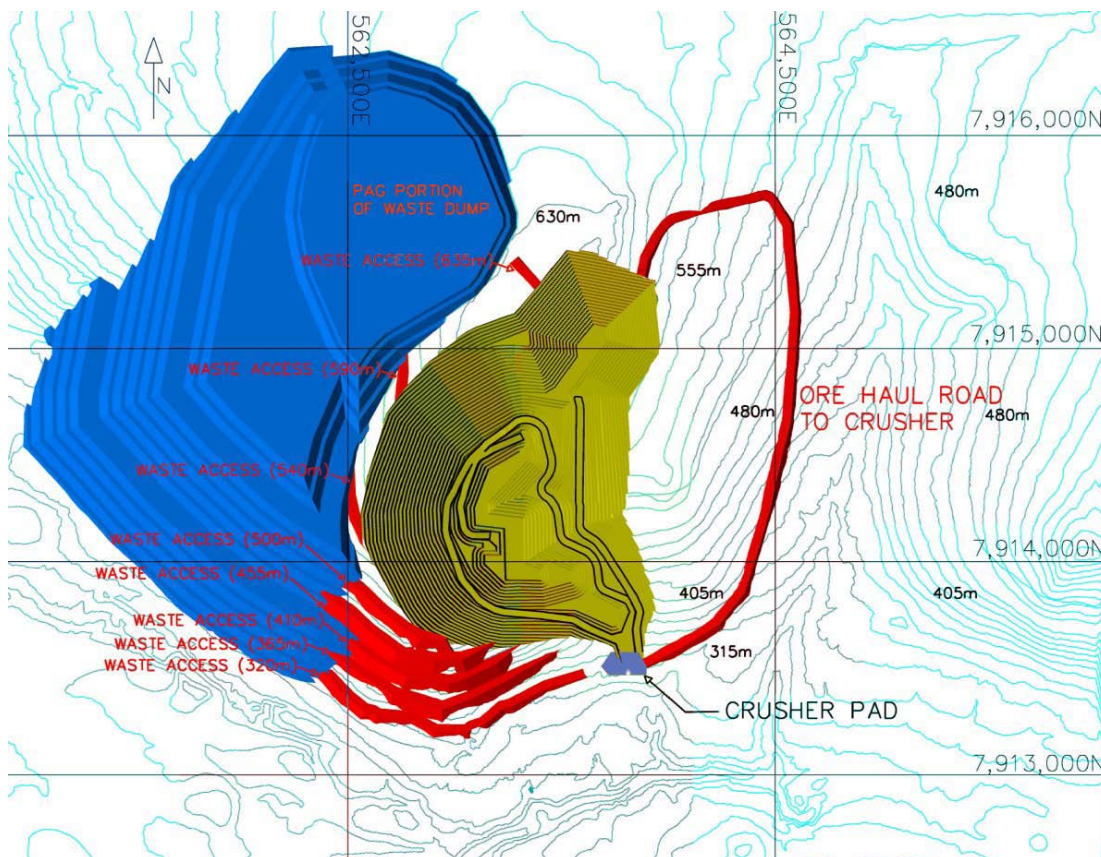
General Layout and Development of Deposit 1 Pit
